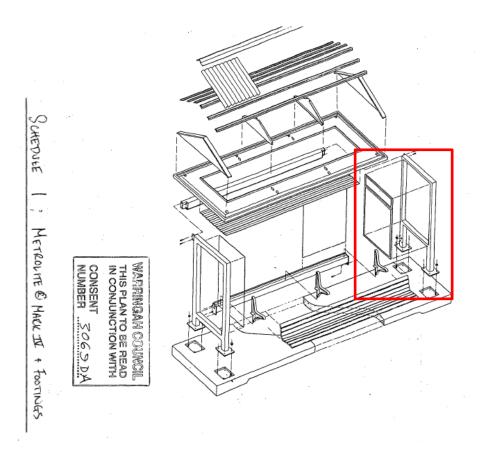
Shelter H3 DA3069 Stamped Plan indicating advertising panel (outlined red)
